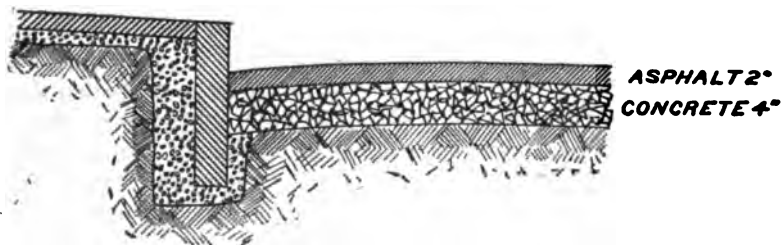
LIGHT-TRAFFIC PAVEMENT.
